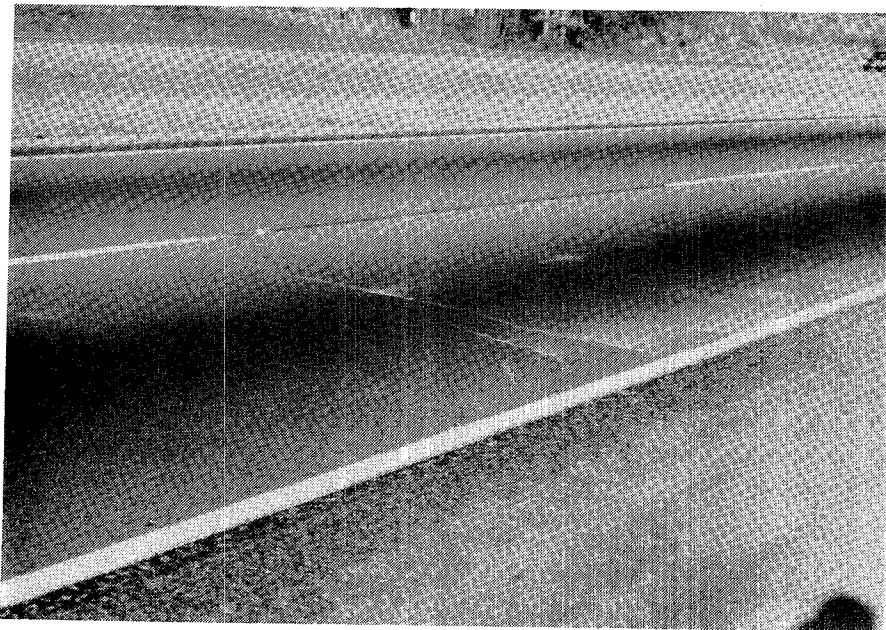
Illustration of fatigue cracking distress for flexible pavement with cement treated base (FLEX-19, Georgia).
